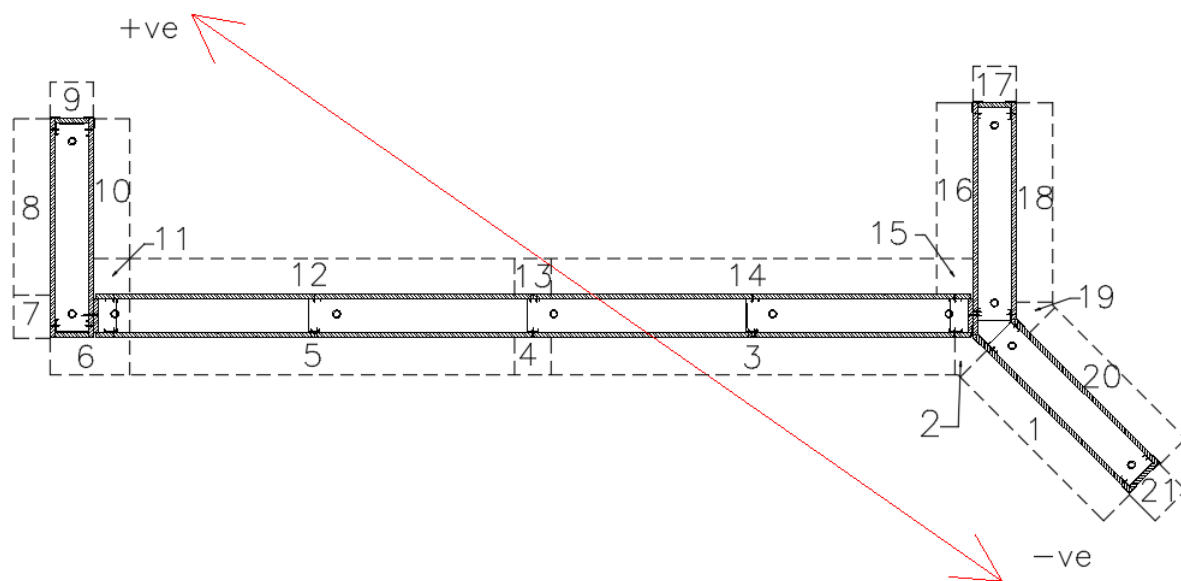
Specimen location references for damage progression tables. Axis of loading a definition of positive loading direction shown in red.
